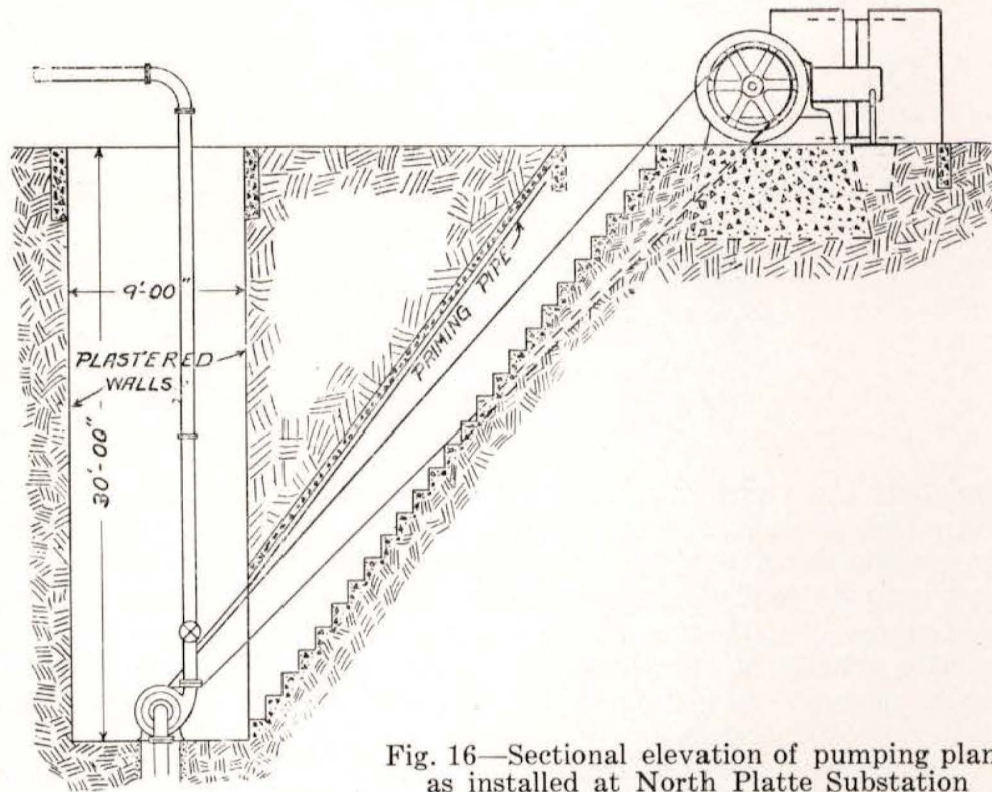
Sectional elevation of pumping plant as installed at North Platte Substation
